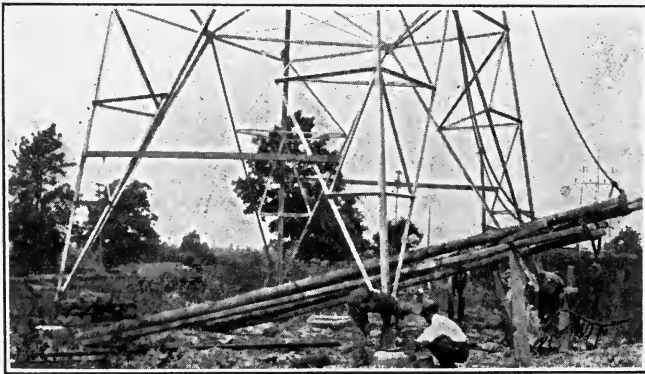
Raising struts—used to reinforce tower against strain of erection.
